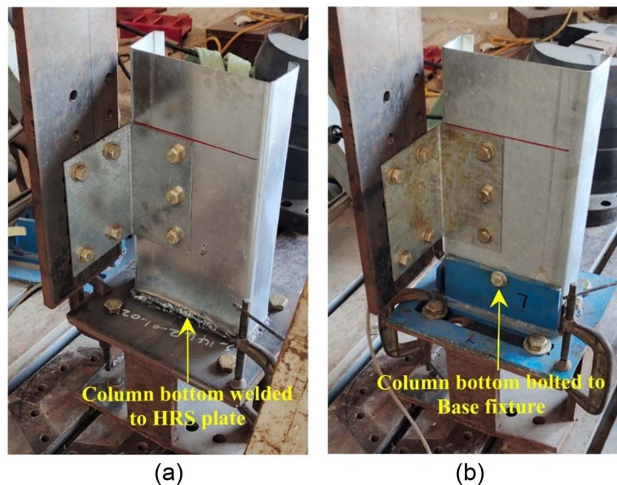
Boundary conditions of test specimen: (a) column base welded; and (b) column base bolted to base fixture.
